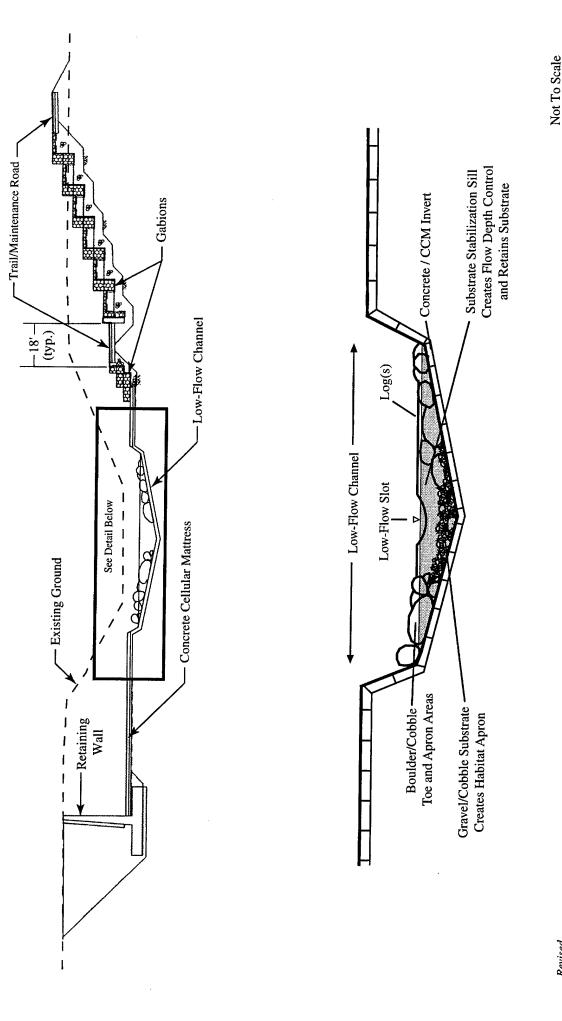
General Cross Section of the Proposed Riverbank and Channel Bed Armoring in Segment 3B between Santa Clara Street and San Fernando Street and the Preliminary Low-Flow Channel with Check Structure Design
